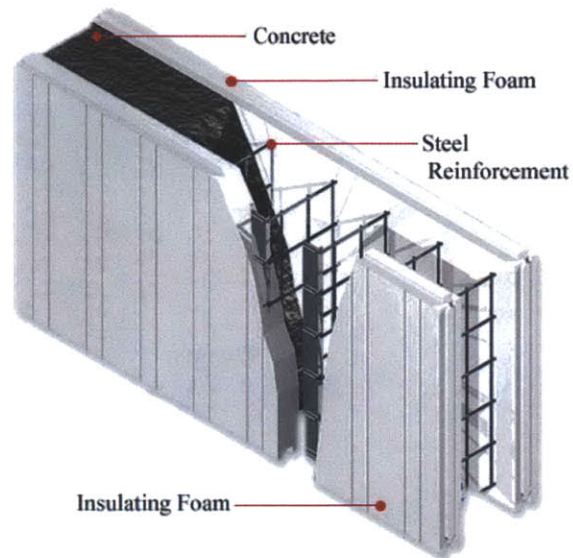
A schematic of a typical ICF block shows the foam walls, steel ties, and cast concrete.
